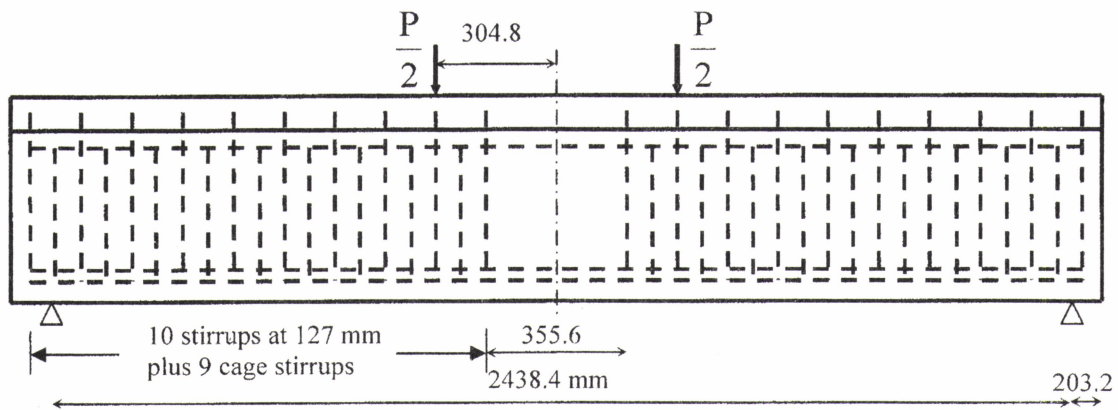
Arrangement of stirrups ($\phi 12$ bars) in beams having the maximum percentage of stirrup steel across the joint (Saemann and Washa, 1964)
